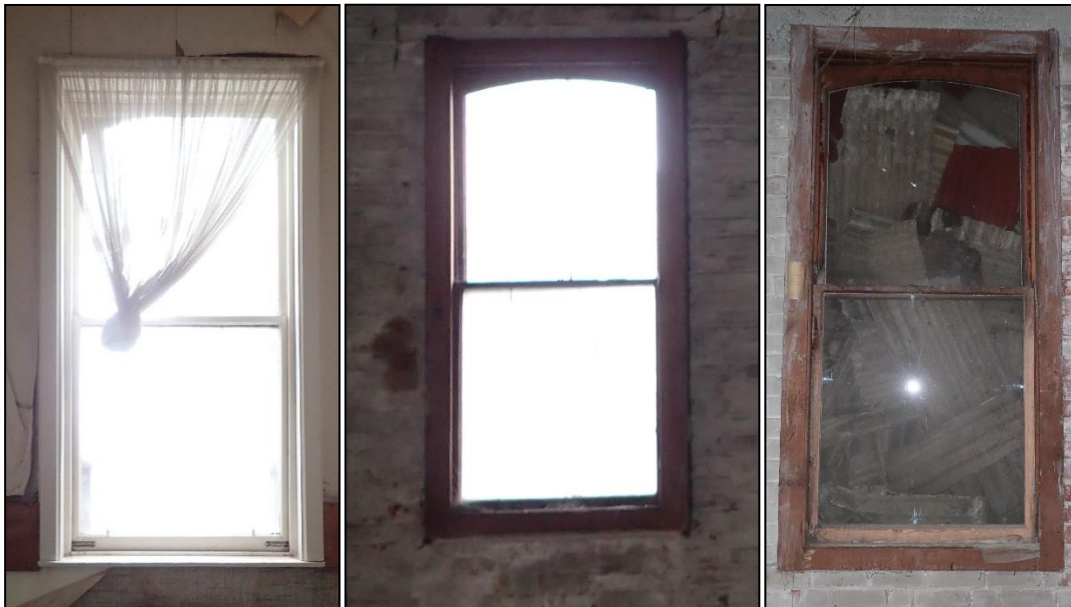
Three sash windows from the first floor of Martin, Maitland & Co.'s Building. Left: east wall of Room 23. Centre: east wall of Room 33. Right : South wall of Room 33.
